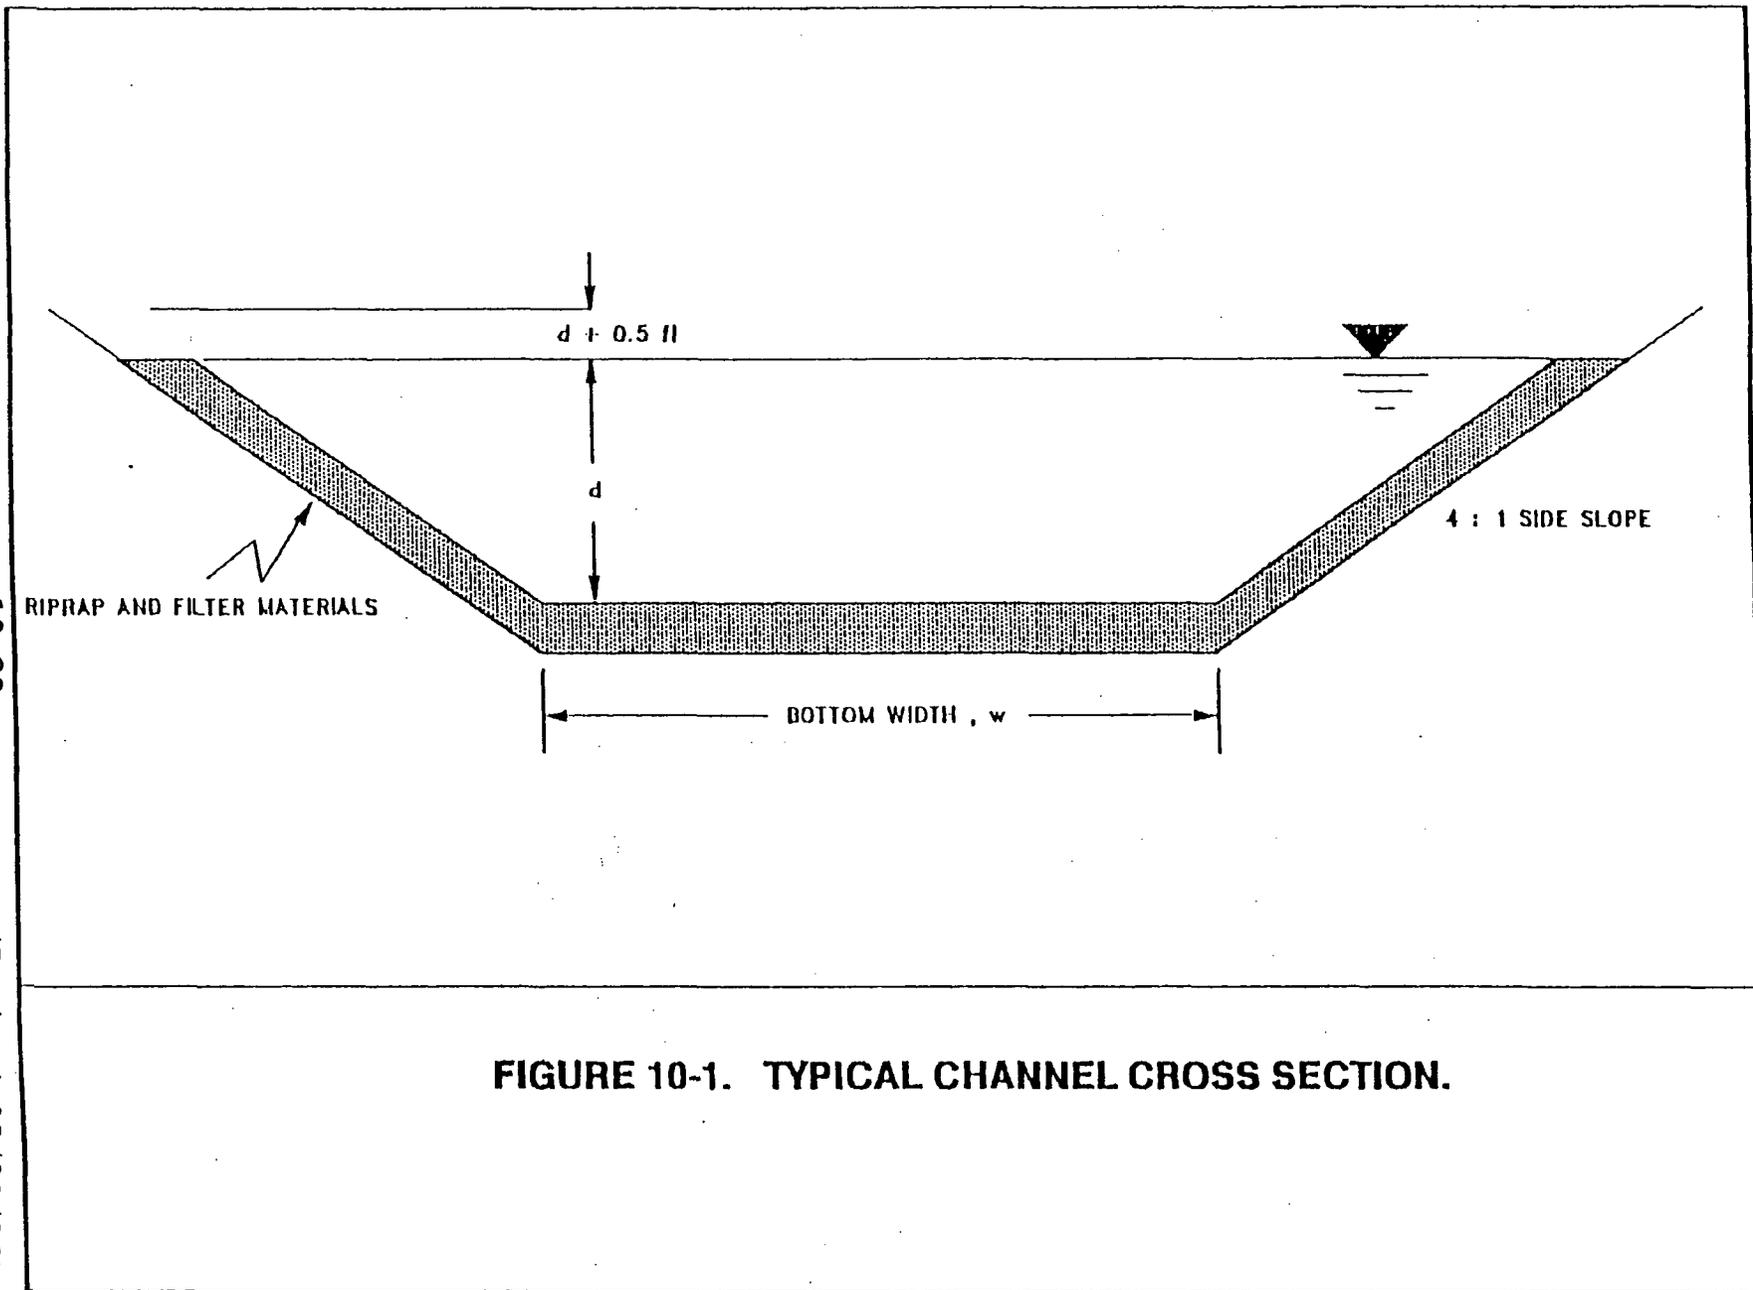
TYPICAL CHANNEL CROSS SECTION.
